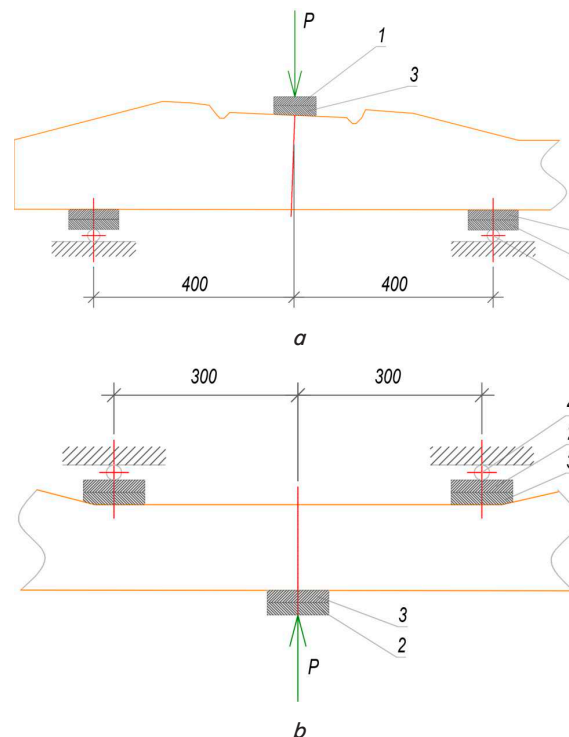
Scheme of sleeper crack resistance tests: *a* – under-rail section; *b* – middle section; 1, 2 – steel plates; 3 – rubber gasket; 4 – steel roller
